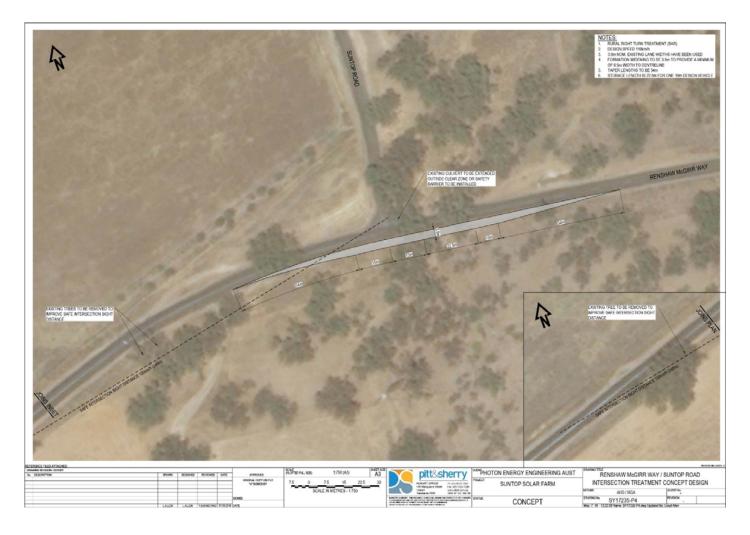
Proposed Widening of Renshaw - McGirr Way at the Suntop Road Intersection.
